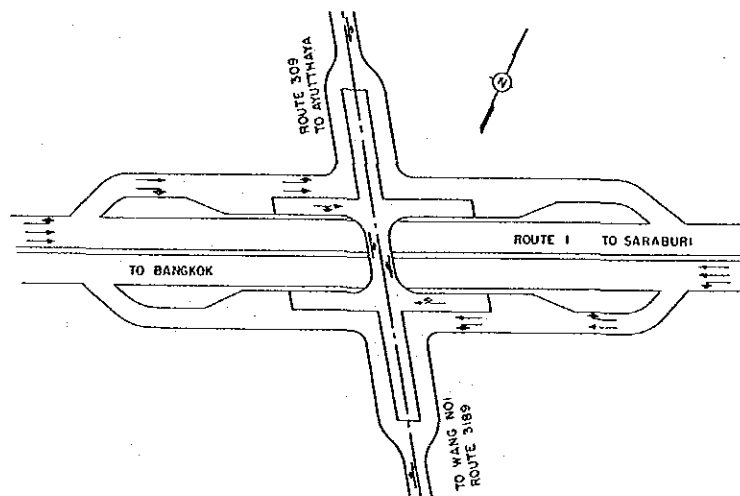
Grade Separation Plan at Wang Noi Intersection
